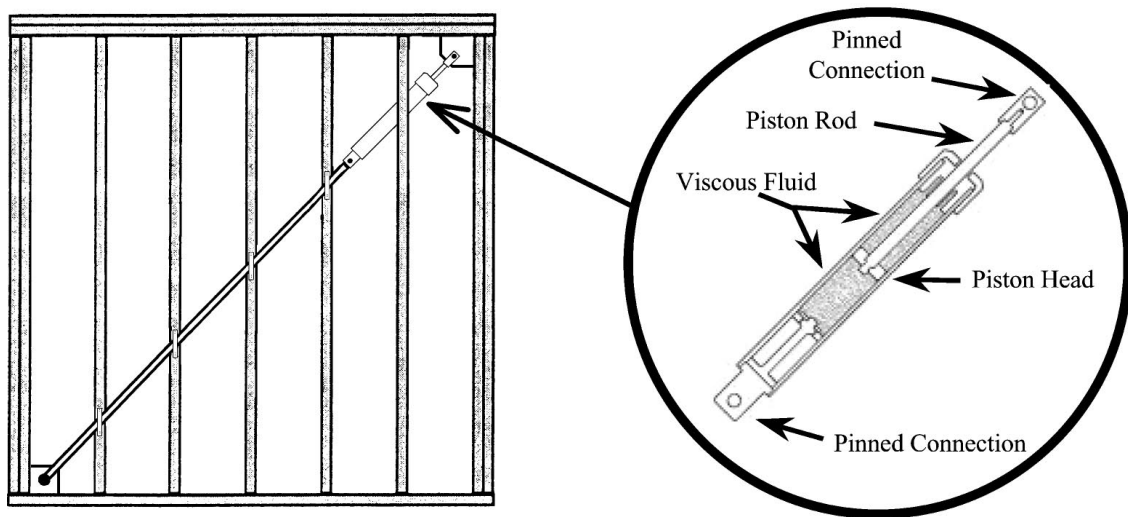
Light timber frame tested with viscous damper in diagonal [2]
